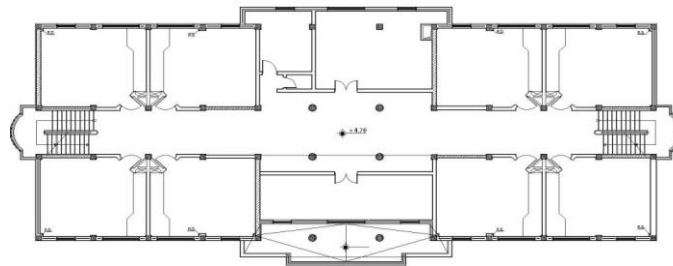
Typical plan of Beheshti school building in Tehran (Nosazi madares, 2010)
